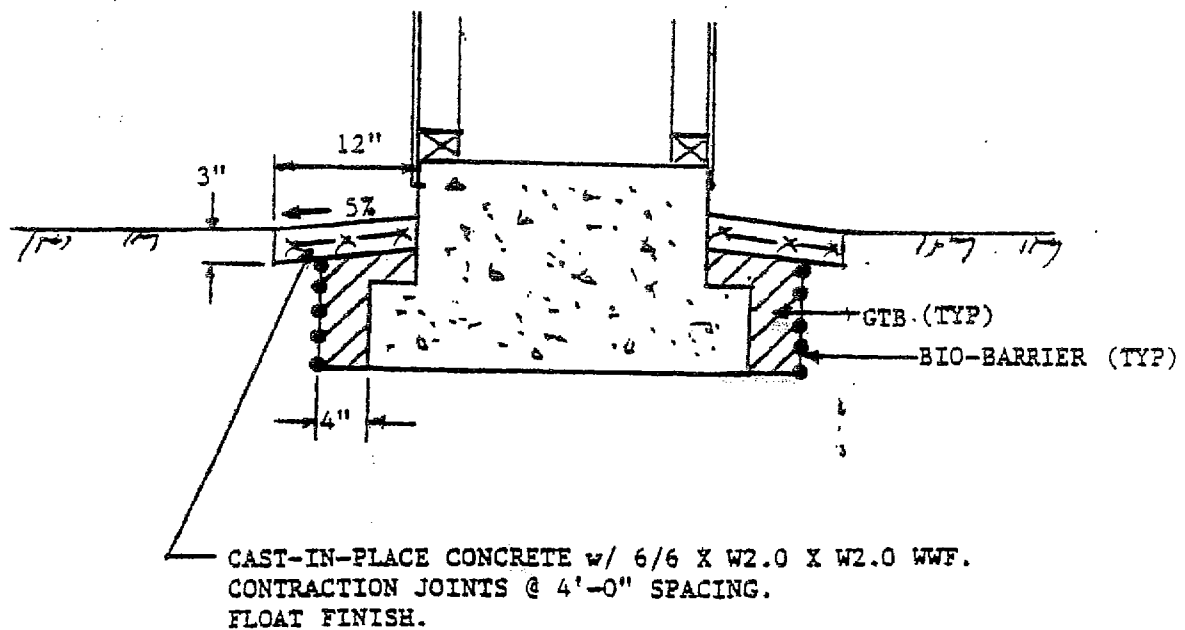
TYP. GTB DETAILS AT EXTERIOR COLUMN FOOTINGS
